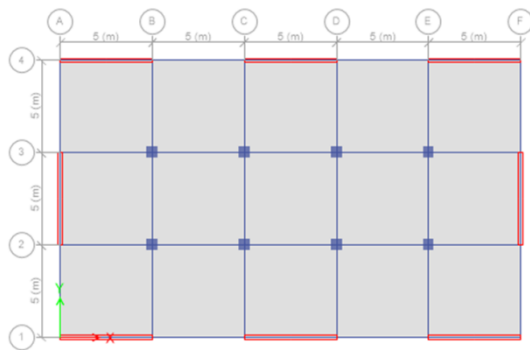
Plan of Solid and Coupled Shear Wall Structure
